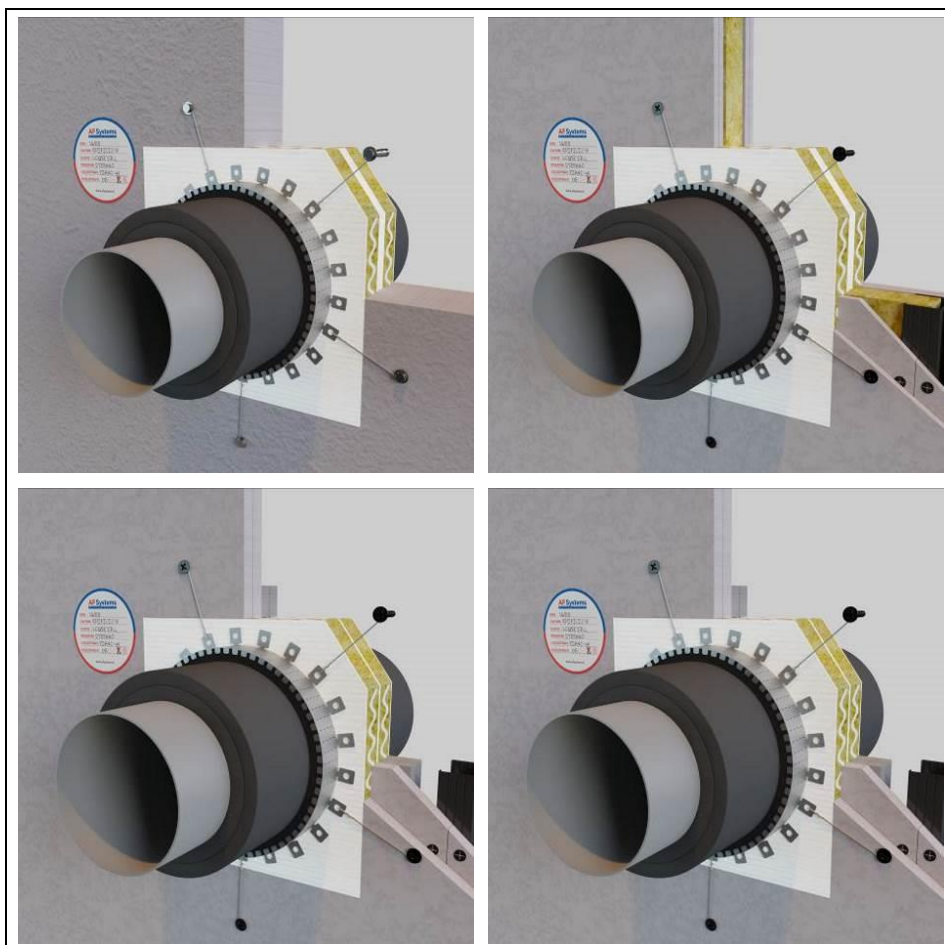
Example of insulated steel pipes passing through AF PANEL seal in walls.
